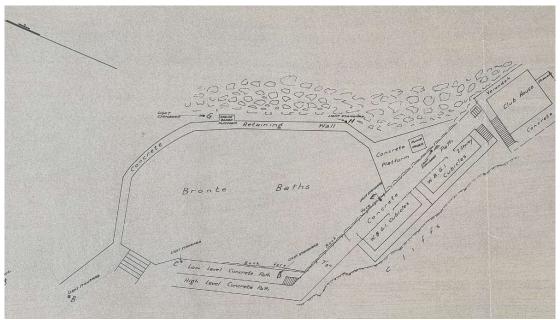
Section of proposed lighting plan (c.1930s/1940s) for the walkway above the pool. Of note on this drawing is that the cliff stair abutting the pumphouse was not shown, although one would have been present. Source: Waverley local studies library, ref: plan 300.
